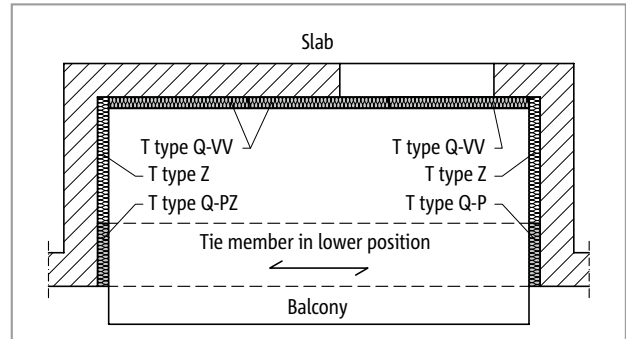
Schöck Isokorb® T type K: Recessed balcony supported on three sides with tie member
